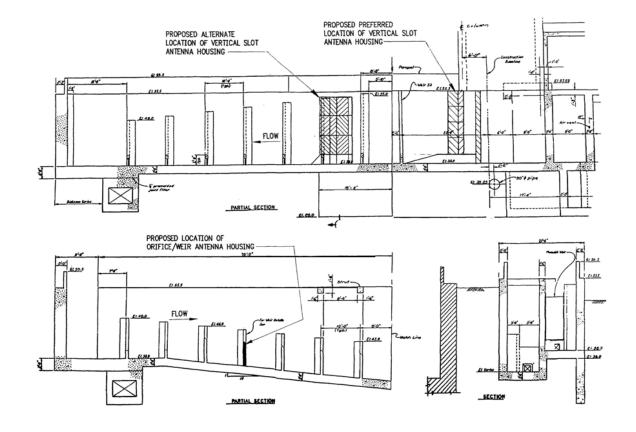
Fisheries Engineering Laboratory - Entrance and Exit Fish Ladders, Plan
